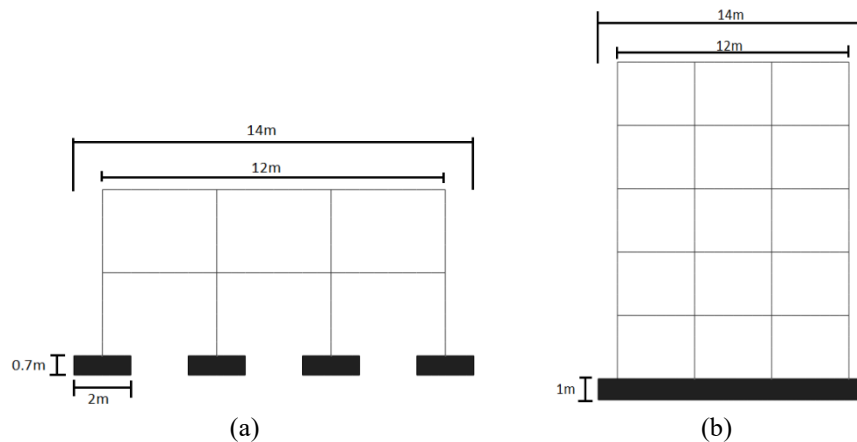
Schematic view of building foundation: (a) building with 2 floors and (b) building with 5 floors.
